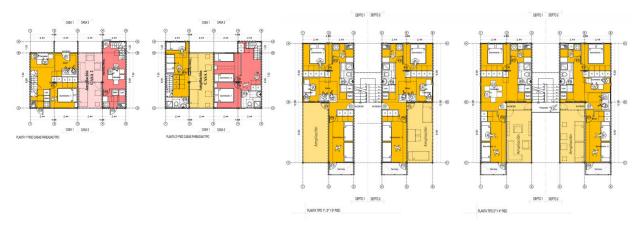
Container housing: the typical floor plans of 2 story and 5 story buildings. (http://www.plataformaarquitectura.cl/2010/05/13/propuesta-de-vivienda-social-en-contenedores-arqydis/)
